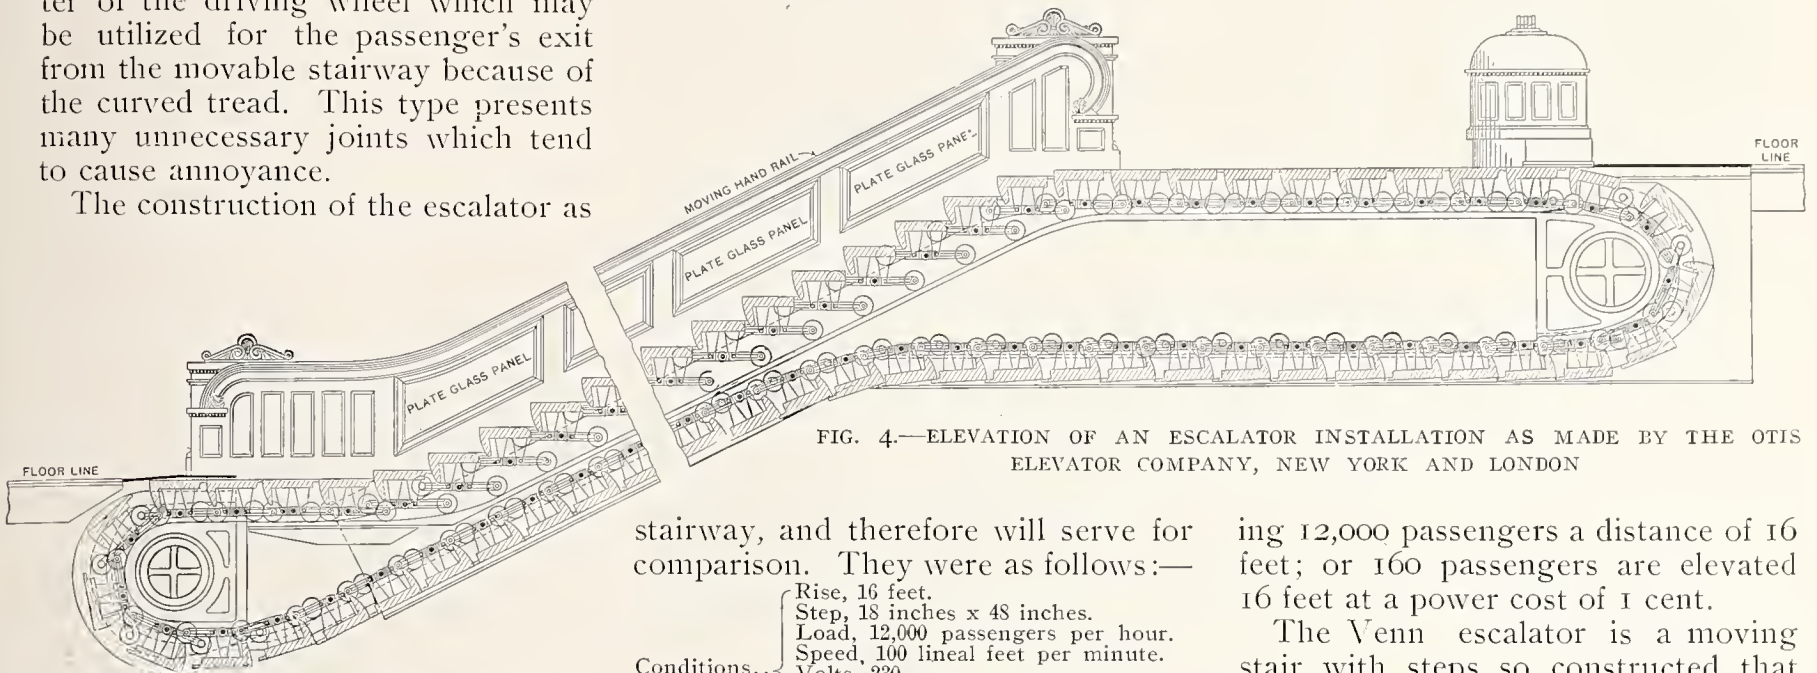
ELEVATION OF AN ESCALATOR INSTALLATION AS MADE BY THE OTIS ELEVATOR COMPANY, NEW YORK AND LONDON
